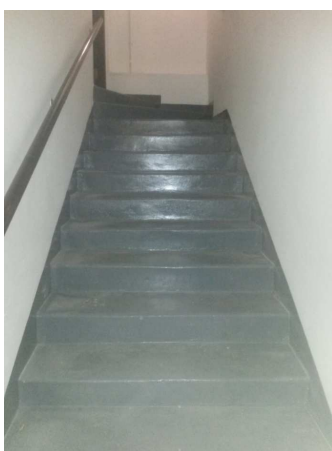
Steps down from Old Assembly building down to basement entrance door
